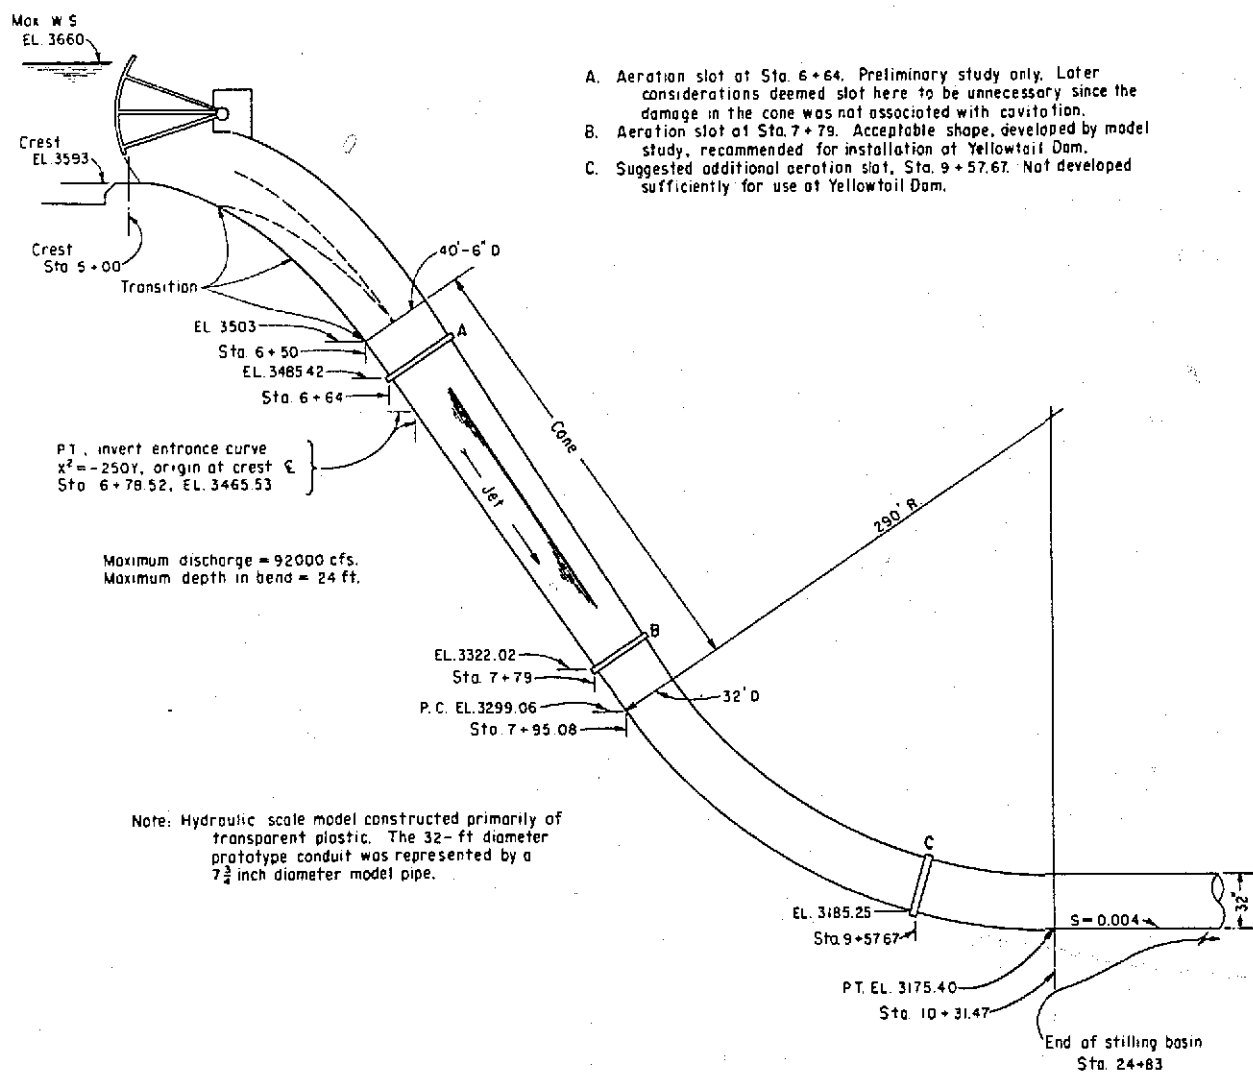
Yellowtail Dam Tunnel Spillway. The laboratory installation was a true scale model to Station 12+75, but did not include the radial control gates.
